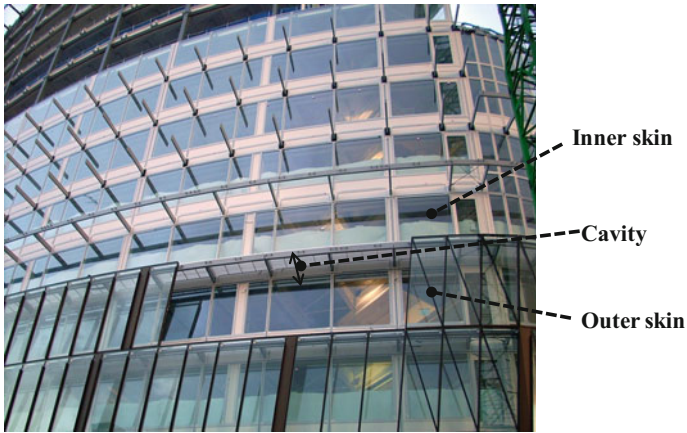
Photo of a building in London showing a double-skin facade being assembled
